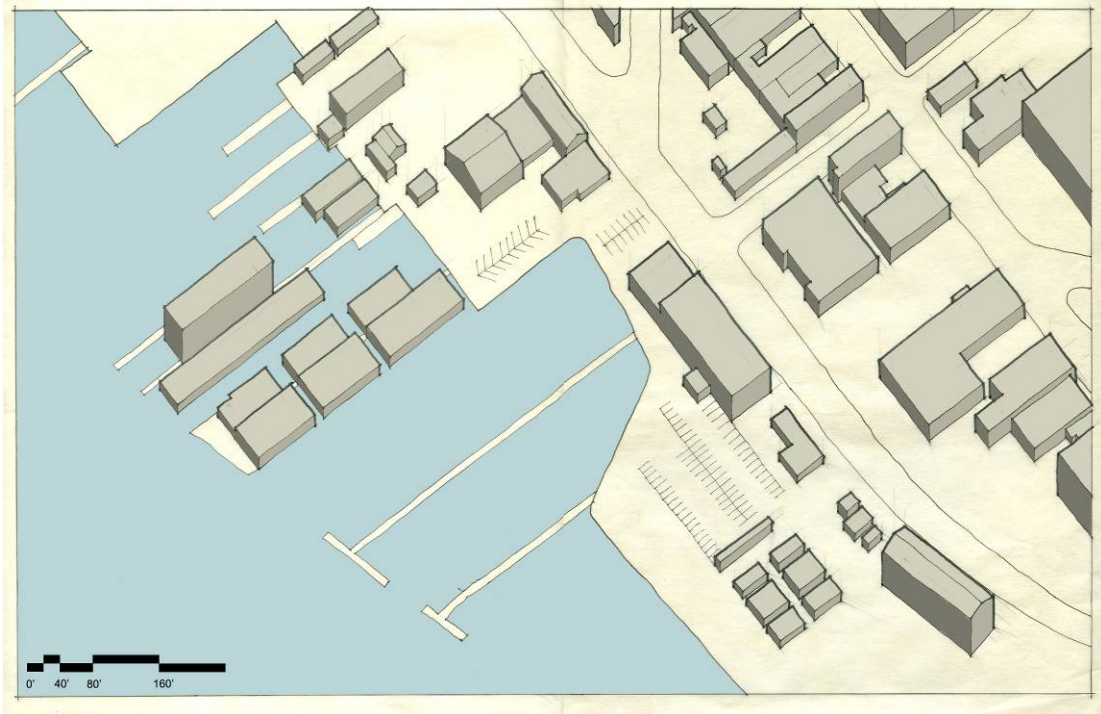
Existing site axonometric showing existing buildings, streets and docks on the site.
